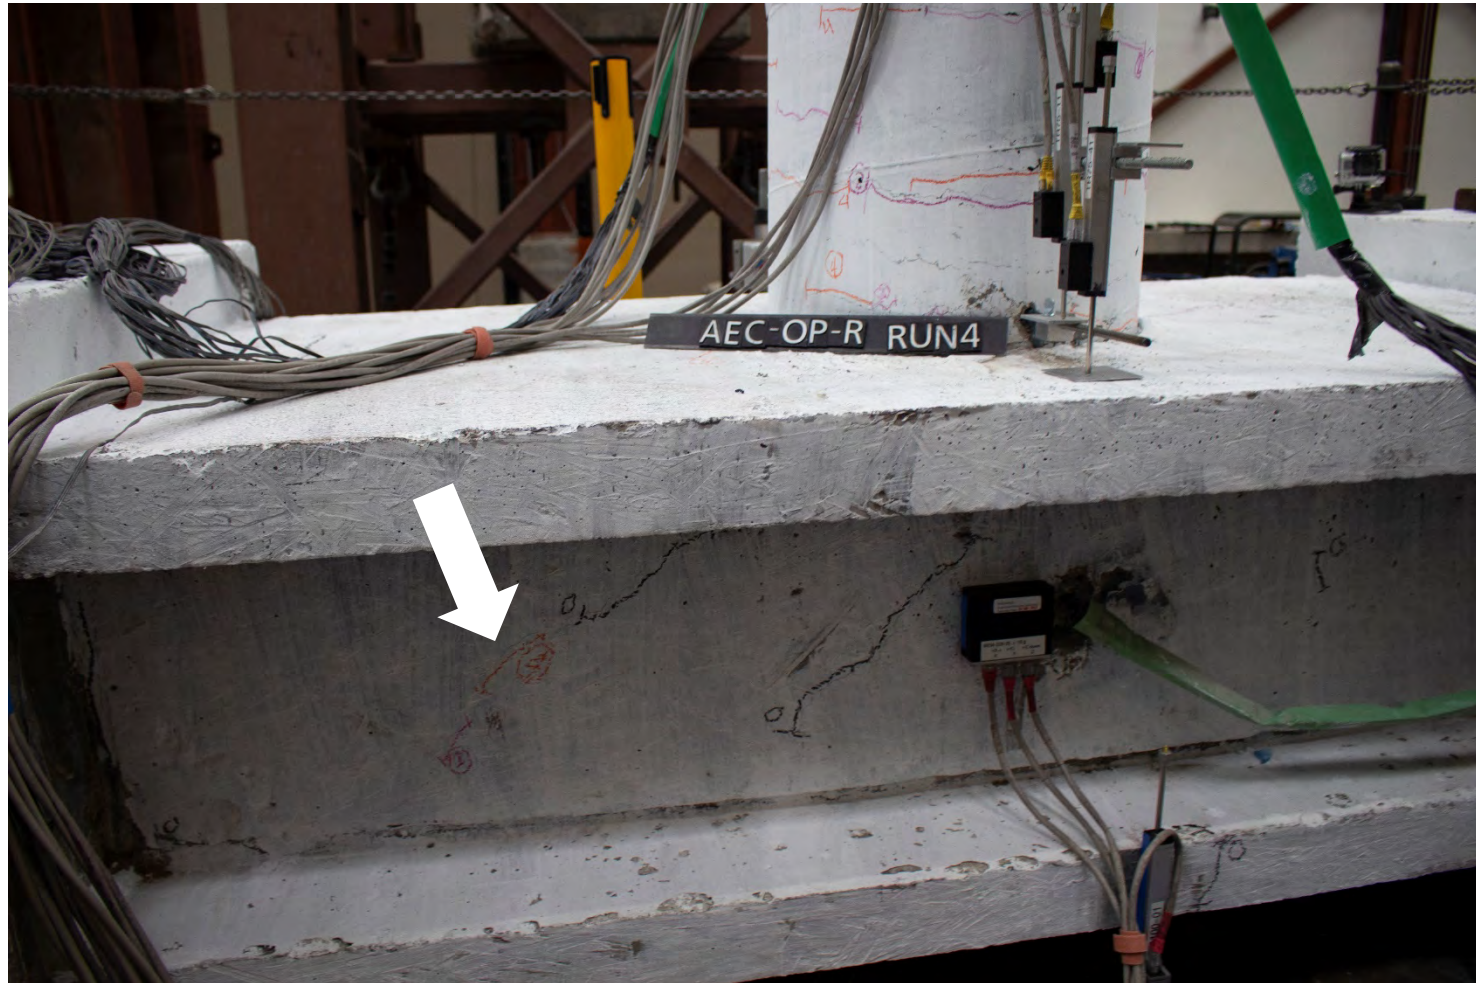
Shear crack occurring on the north side cap beam (run #4)
